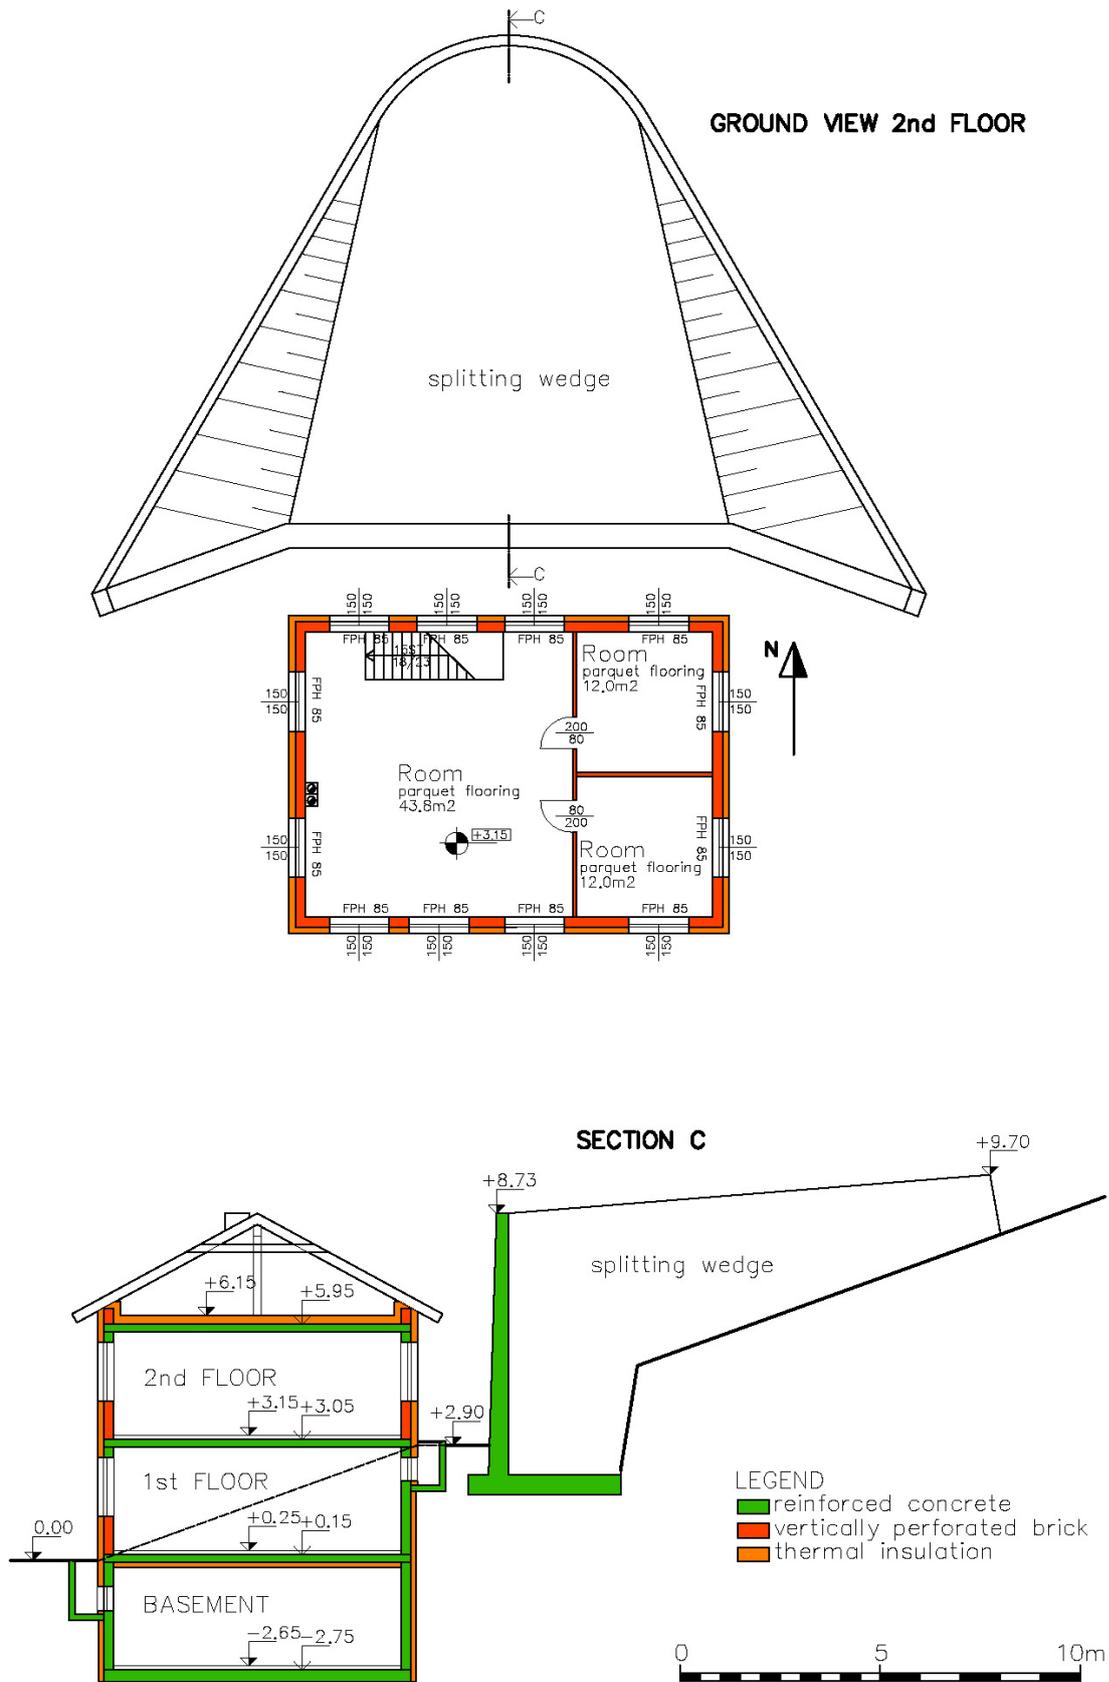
Splitting wedge to protect a building against the impact of snow avalanches.
